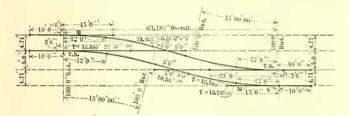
B. R. T. STANDARD TRACK LAYOUT OF 9-IN. GIRDER RAIL CROSSOVER
